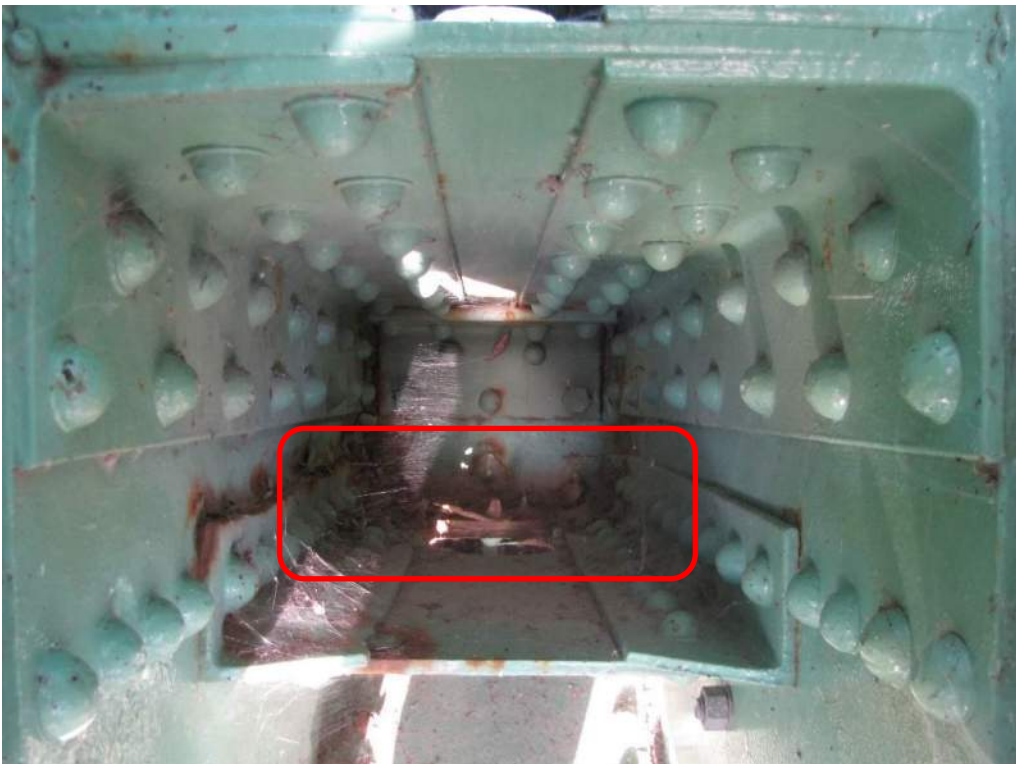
Severe corrosion and section loss of rivet heads at the base of tower truss member 15N-17N and section loss of the stiffening angles and stiffening plate at the main trunnion.
